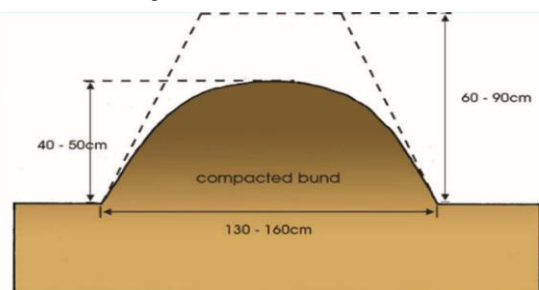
Cross-section of a compacted bund showing recommended height, width, and side-slope dimensions.
